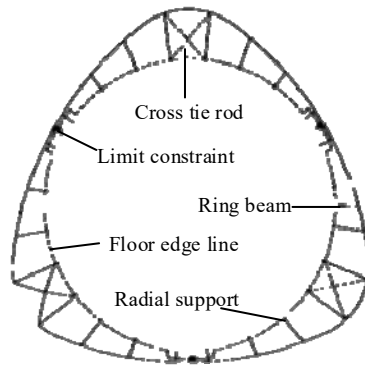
Layout of plane support structure for semi hidden frame glass curtain wall in high-rise buildings
